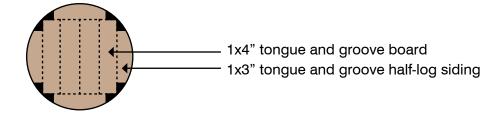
5" small-scale timber section showing cut lines for making exterior and/or interior siding boards.
